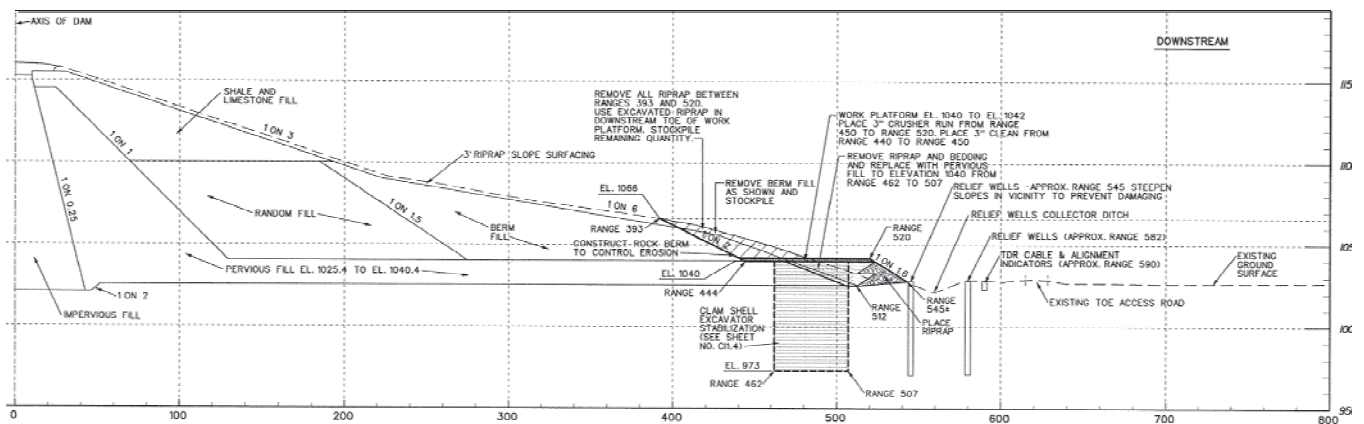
Typical cross-section of Tuttle Creek Dam
